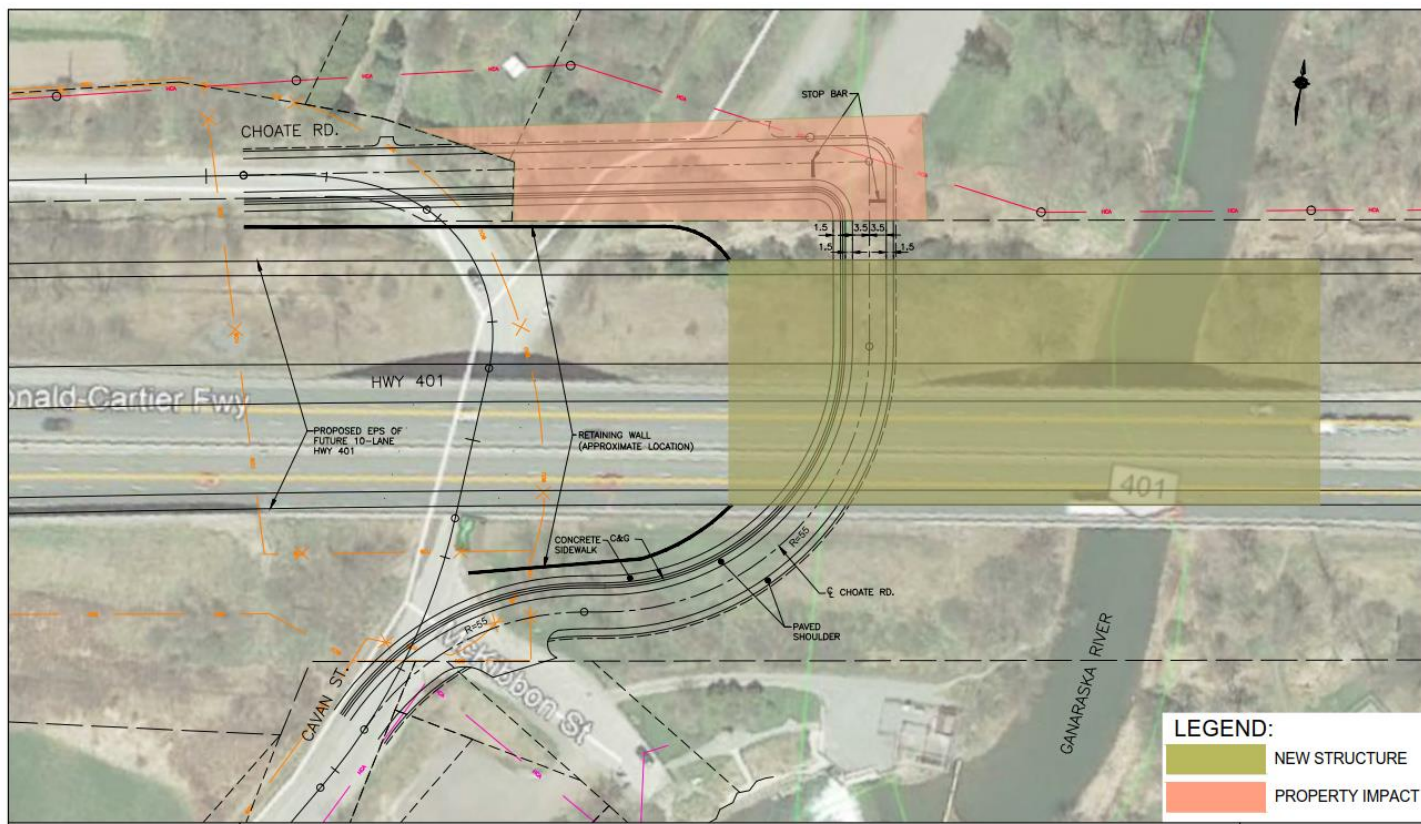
Choate Road and Ganaraska River bridges Alternative 3B
